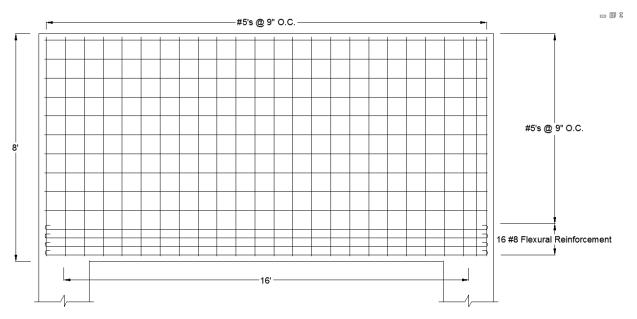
Deep Beam Method Design Example 2 - Longitudinal Section
